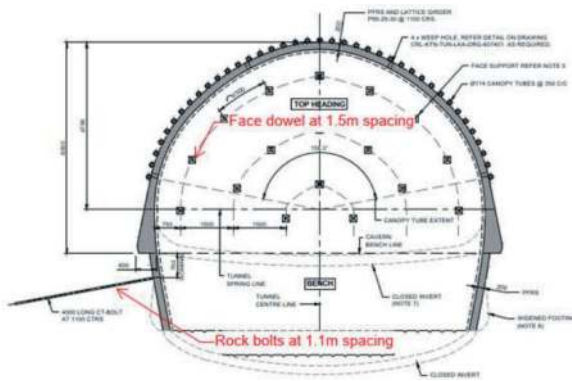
Tunnel face dowel arrangement for MC30/MC60 cavern.
